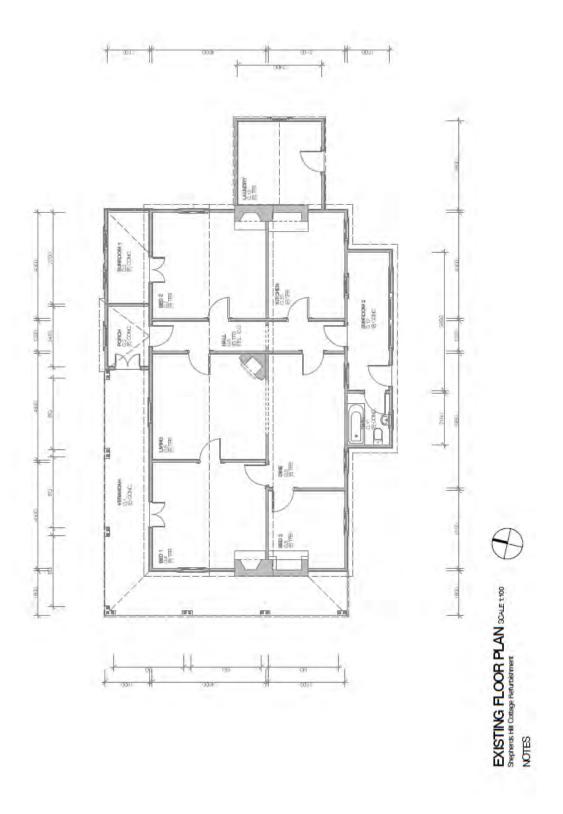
Existing floor plan of the cottage, showing the layout of the building prior to conservation works. (Source: Curran, drawing no. A100, revision A, 2 August 2017)
